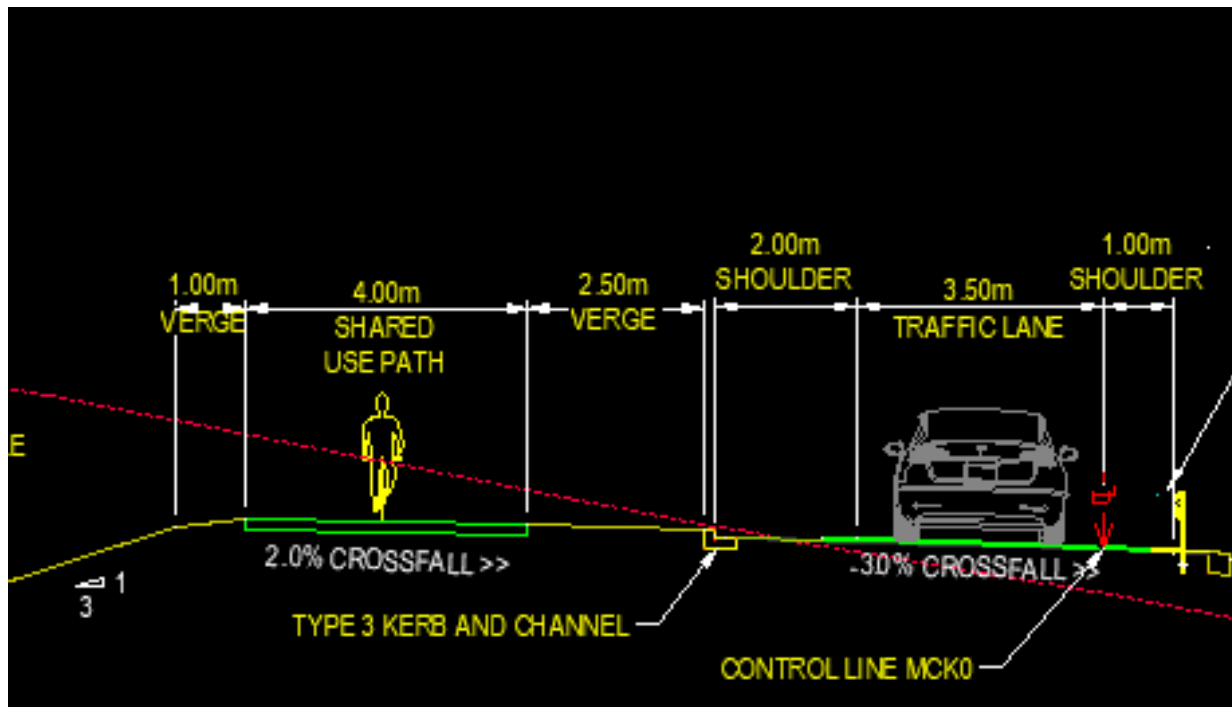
Typical cross section of ramp with a SUP on the western side
